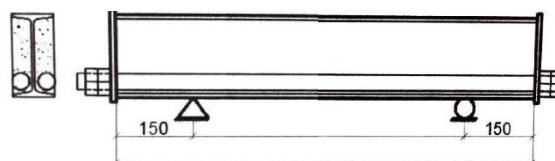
Scheme of additional prestressed internal reinforcement of steel-concrete beams [10]
